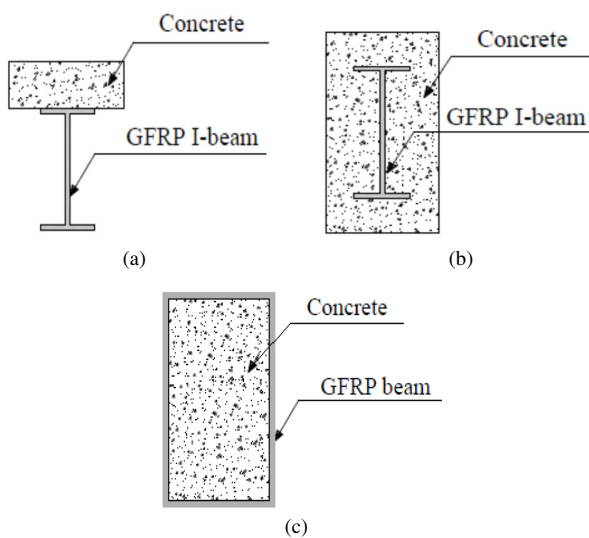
Types of composite beams: (a) composite section, (b) encased pultruded GFRP beam, (c) concrete-filled GFRP tube.
